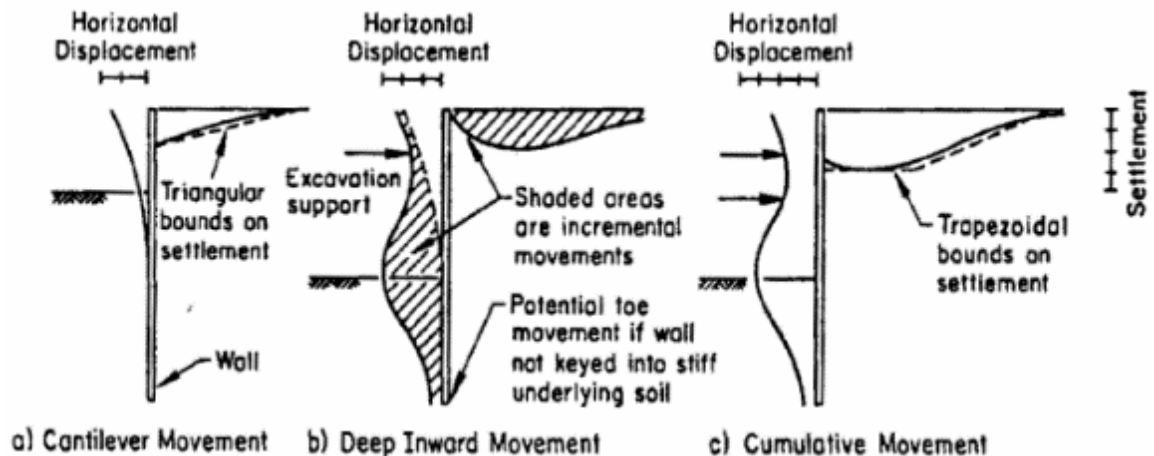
Typical scheme of ground movements for braced excavation systems. After (Clough and O'Rourke 1990).
